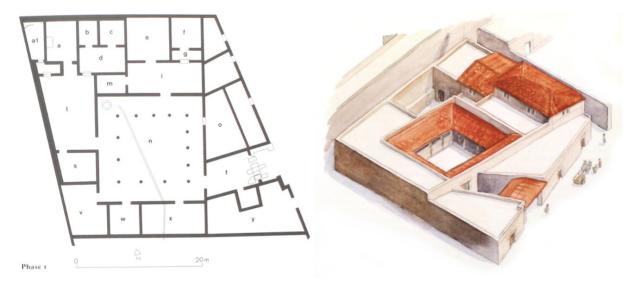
Plan and reconstruction of House II at Eretria (Ducrey 2004, 161 and 163).
